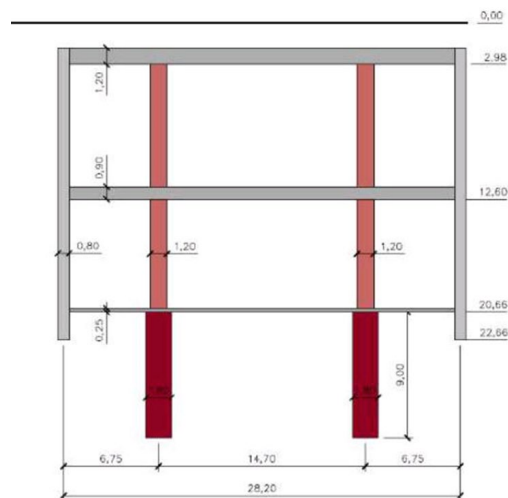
scheme of the shallow underground structure considered in this study (dimensions in meters).
